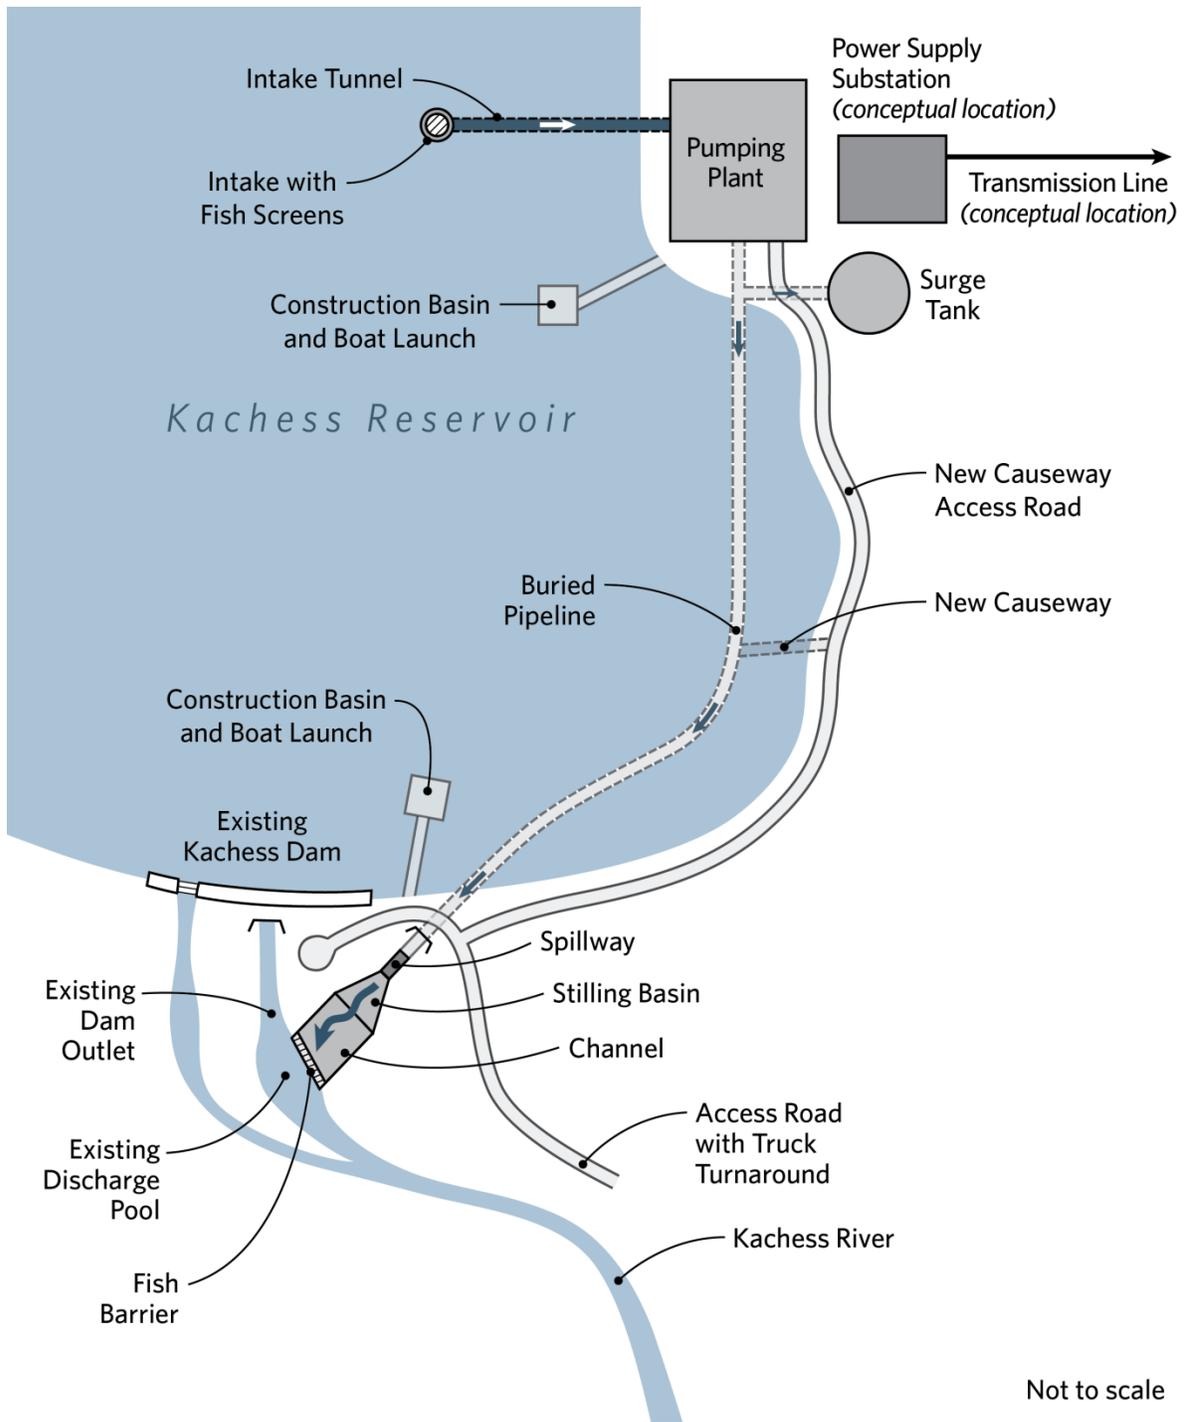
KDRPP East Shore Pumping Plant Conceptual Site Plan
